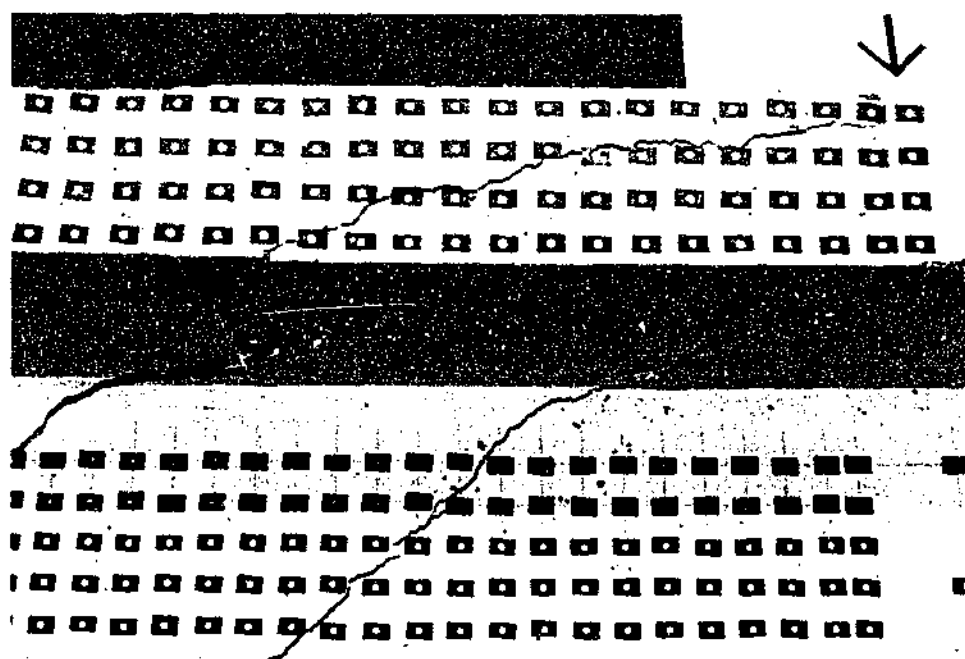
Diagonal crack extending from web into flange of control beam
